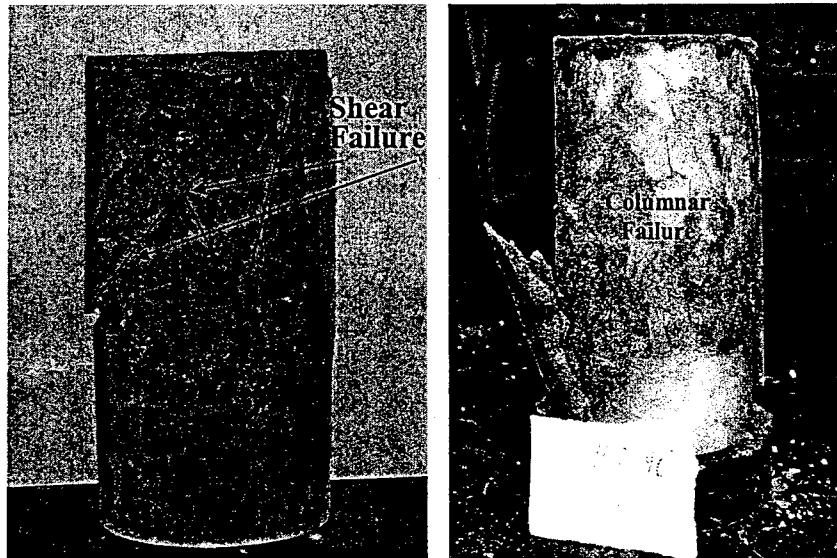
Normal failure mode for concrete (left) and failure mode of cenosphere concrete (right)
